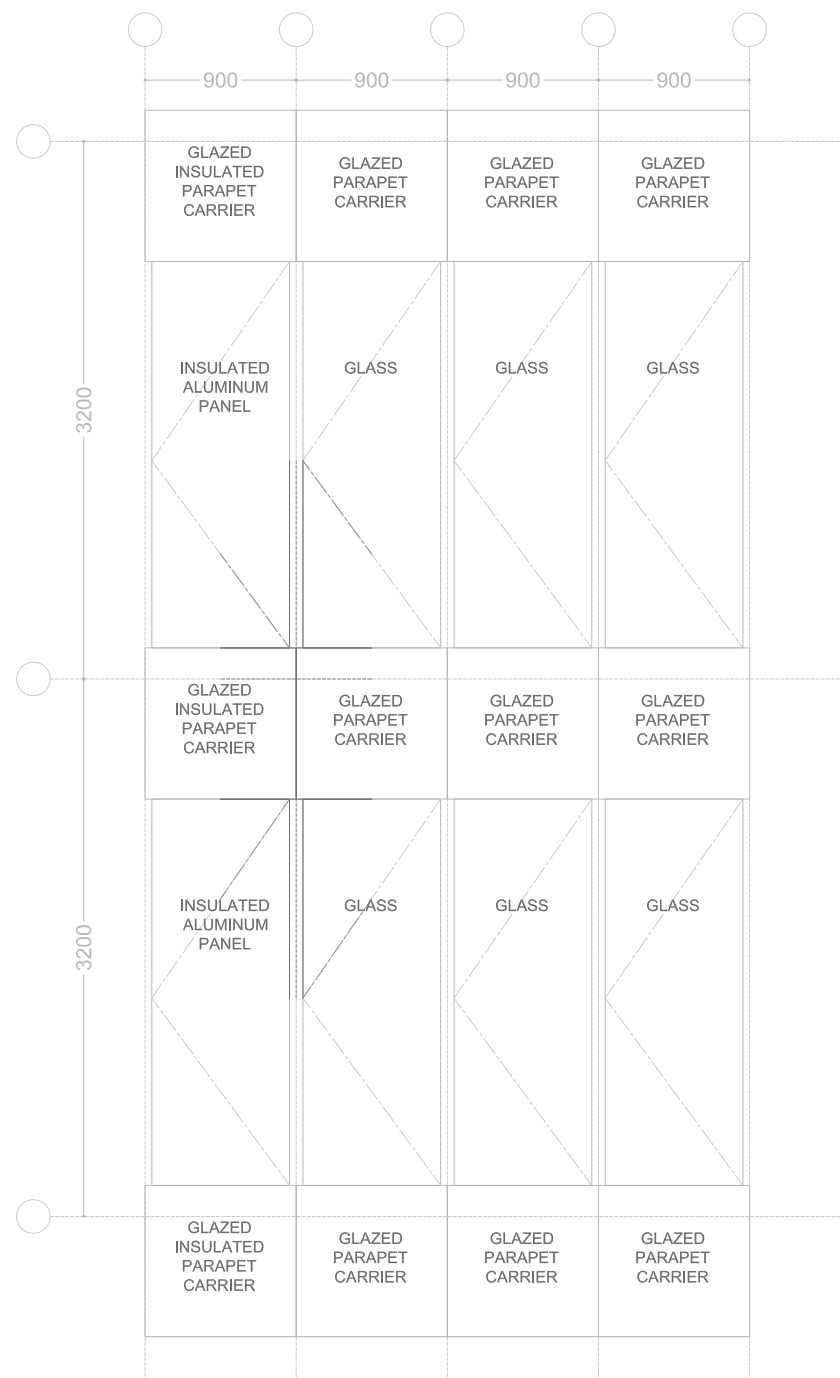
Indicative elevation view of existing curtain wall facade for proposed case (Source – Author)
